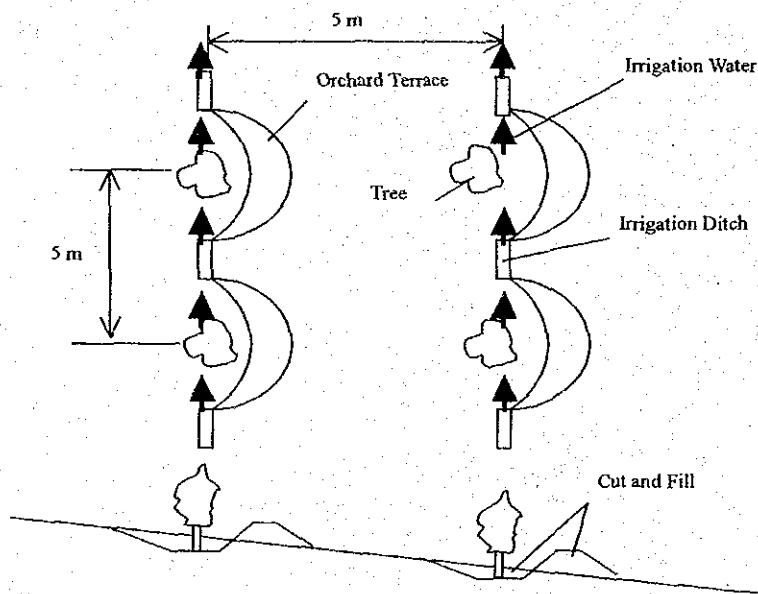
General Plan and Profile of Orchard Terracing
